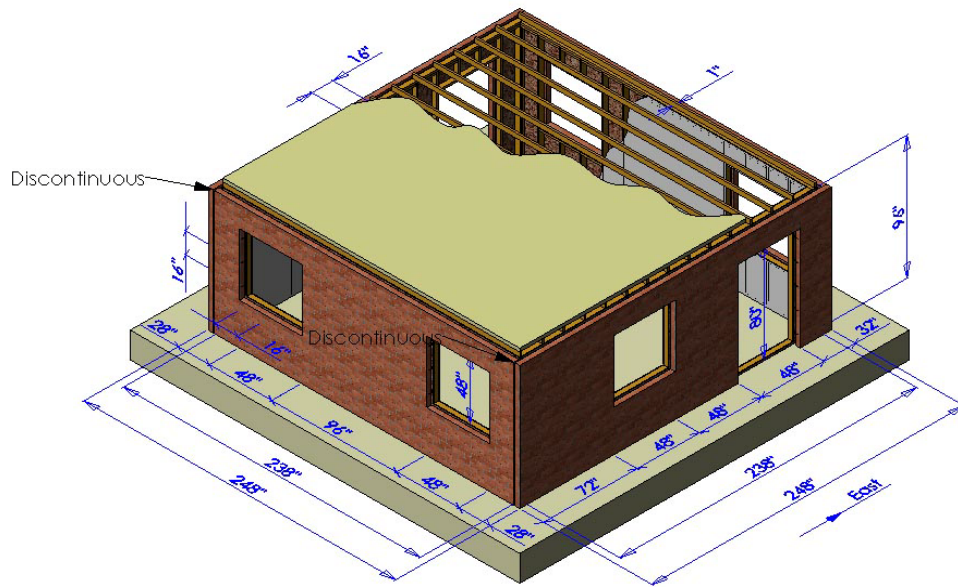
Prototype structure, wood-stud frame with clay masonry veneer
